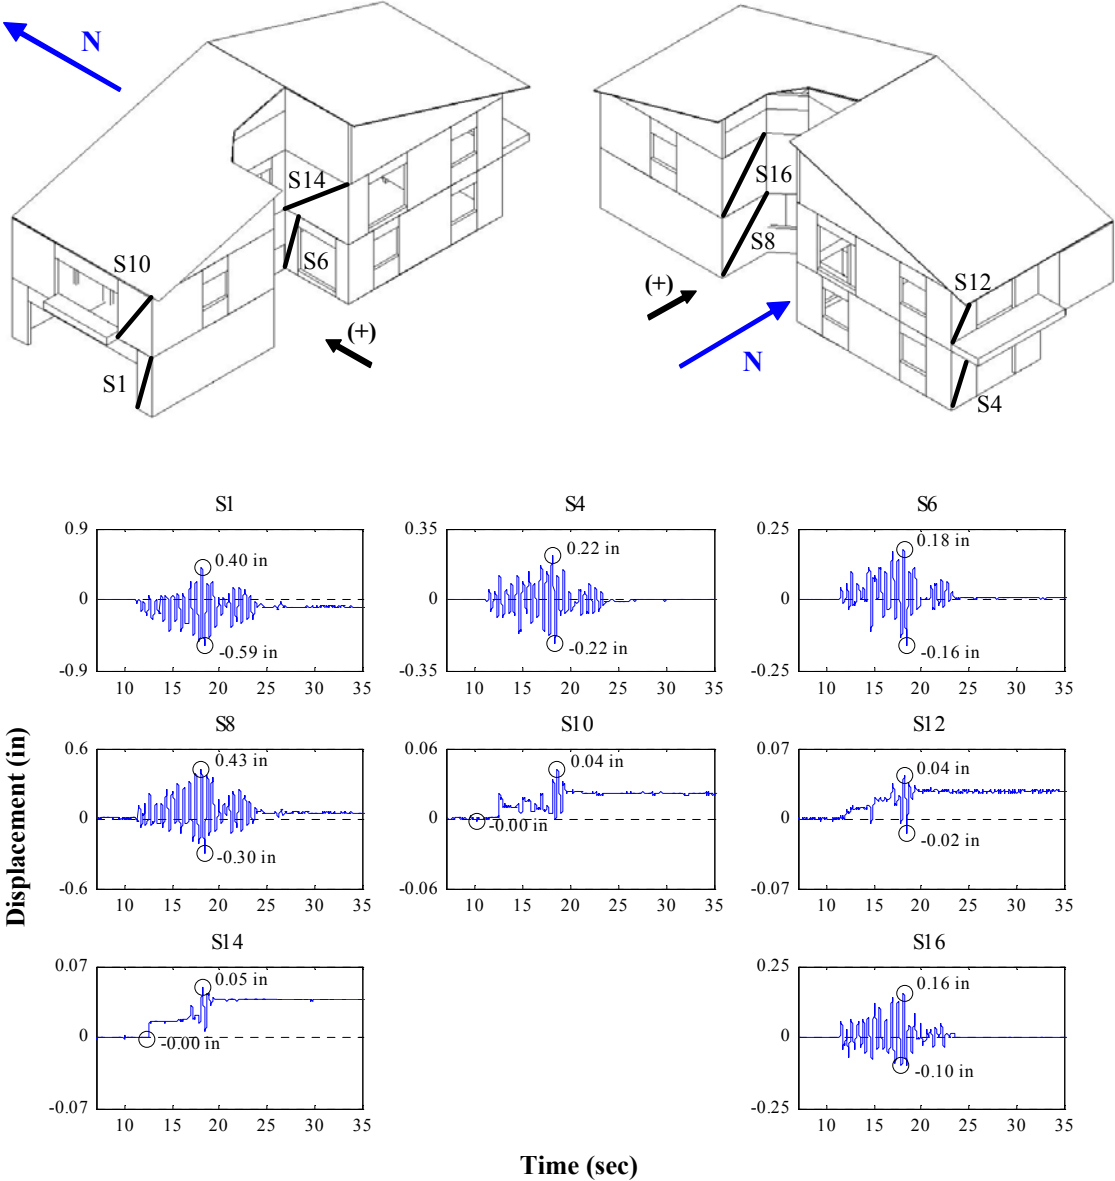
Wall deformations of north-south external walls for Test NWP4S03
